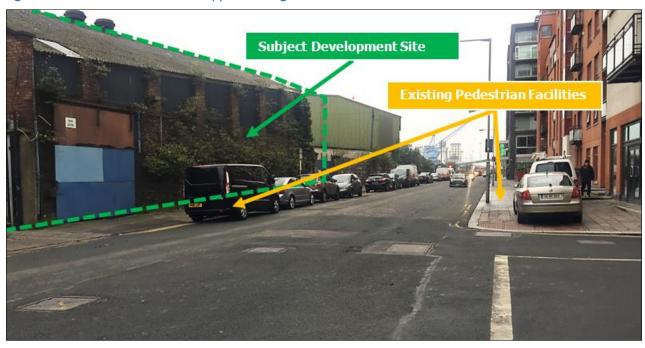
View of Sheriff Street Upper Looking West¹⁷⁰
